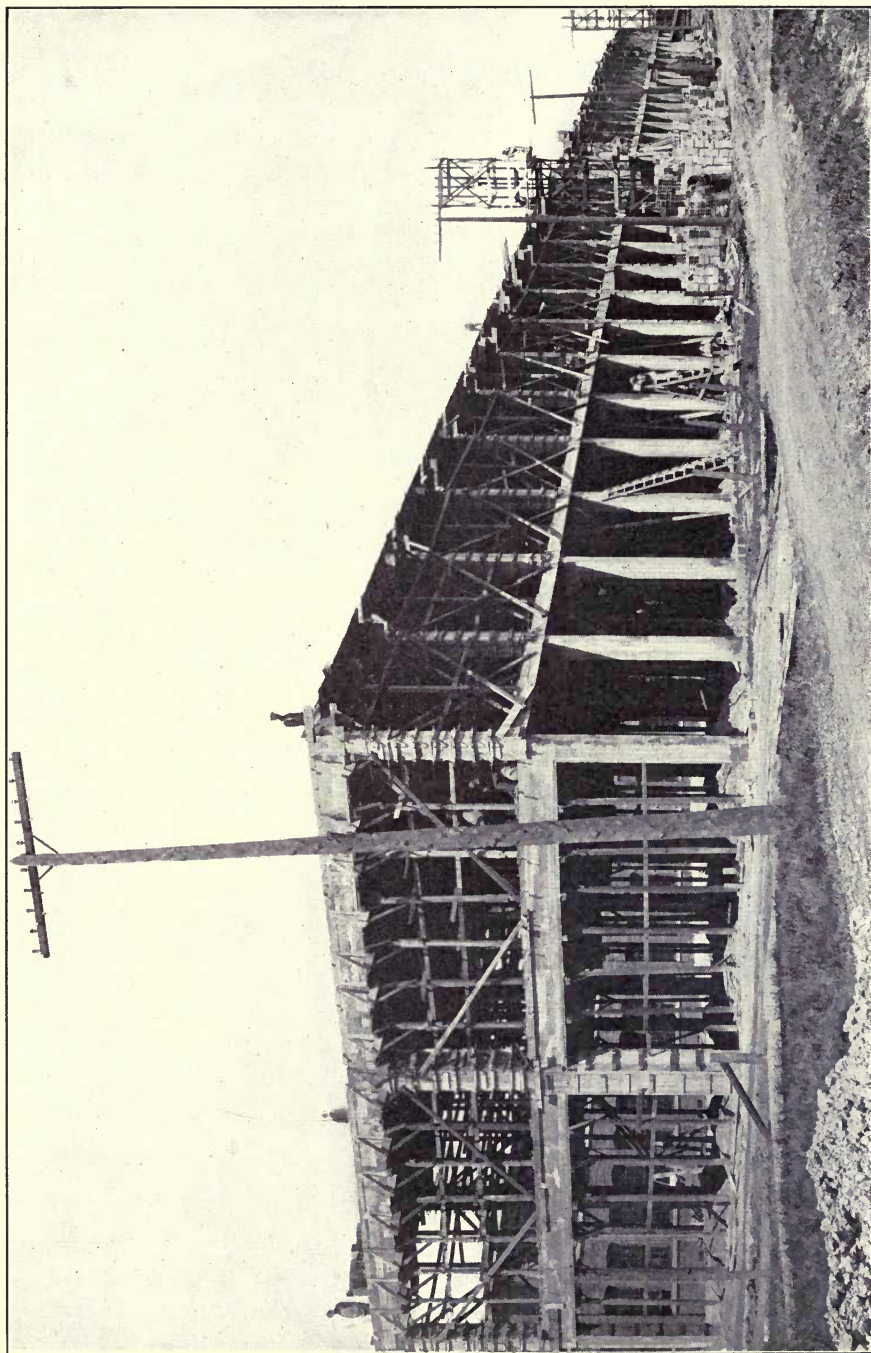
Exterior View of Packard Factory Under Construction, Showing Second Floor Centering in Place. (See p. 142.)
